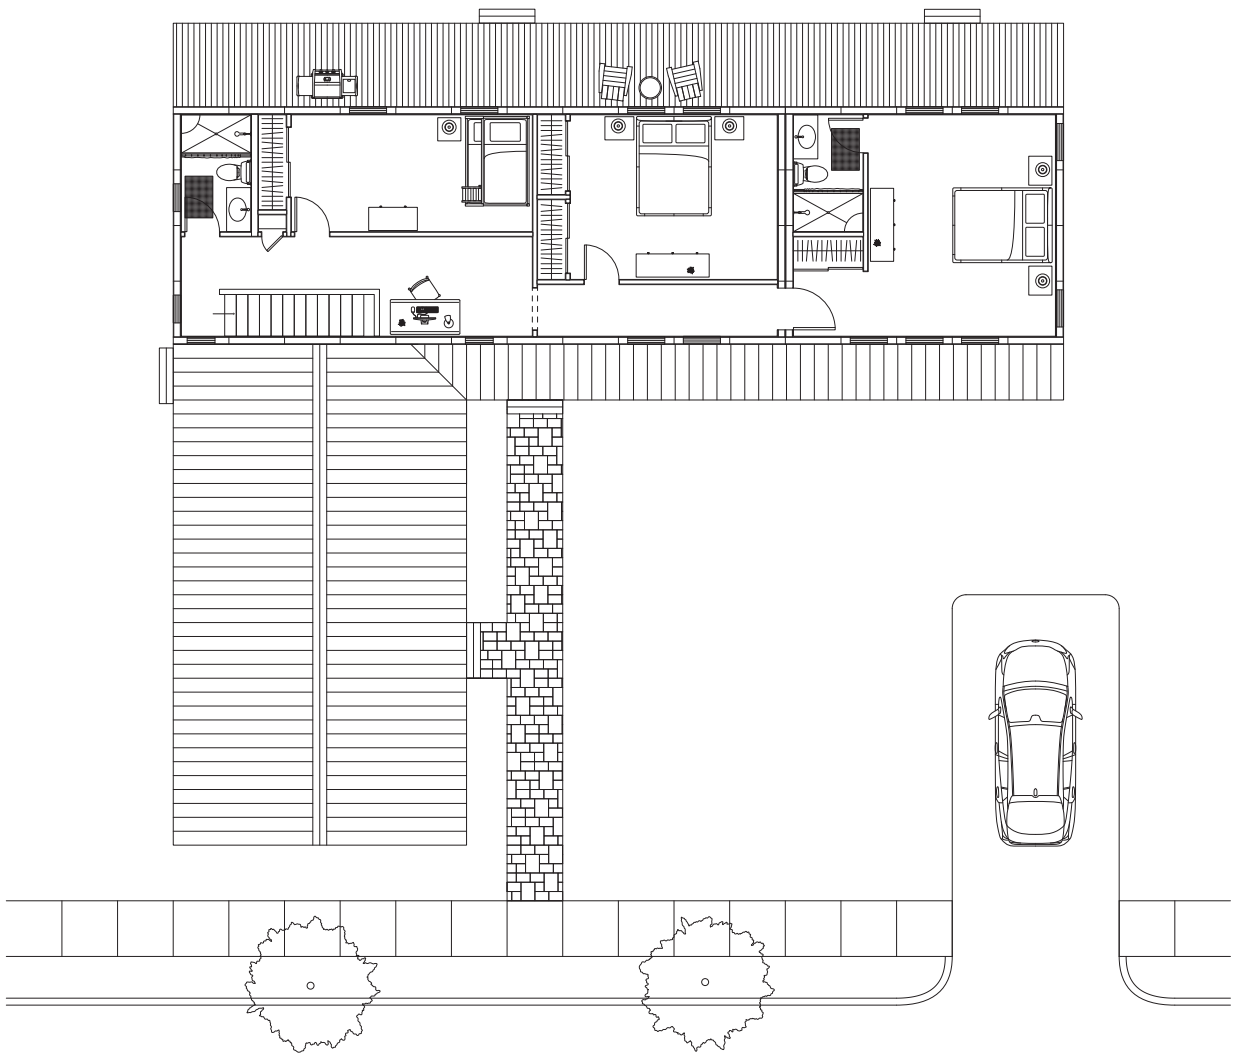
The Inverted Ell, Second Floor Plan, Fully Developed
